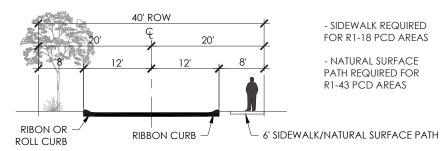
EXHIBIT R: STREETSCAPE CROSS SECTIONS
